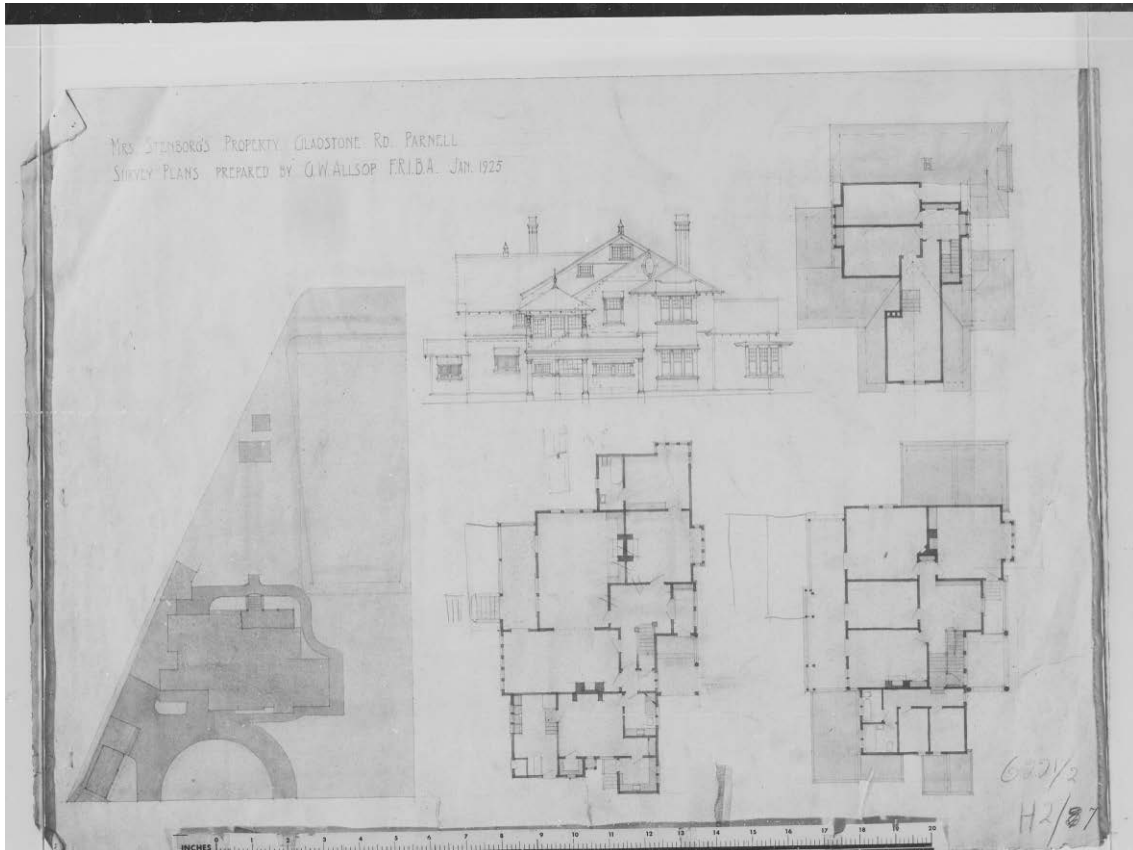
Surveys plans of the subject building drawn by architect G. W. Allsop in January 1925. It is likely that the layout as shown closely represents the plan of the building as constructed between 1902-5. *Plans 4000-7099, 1872-1993, Record ID. 431433, AKC 033 City Engineers Works Plans Aperture Cards 1872-1993, Item No. 2, Auckland Council Archives, Auckland.
